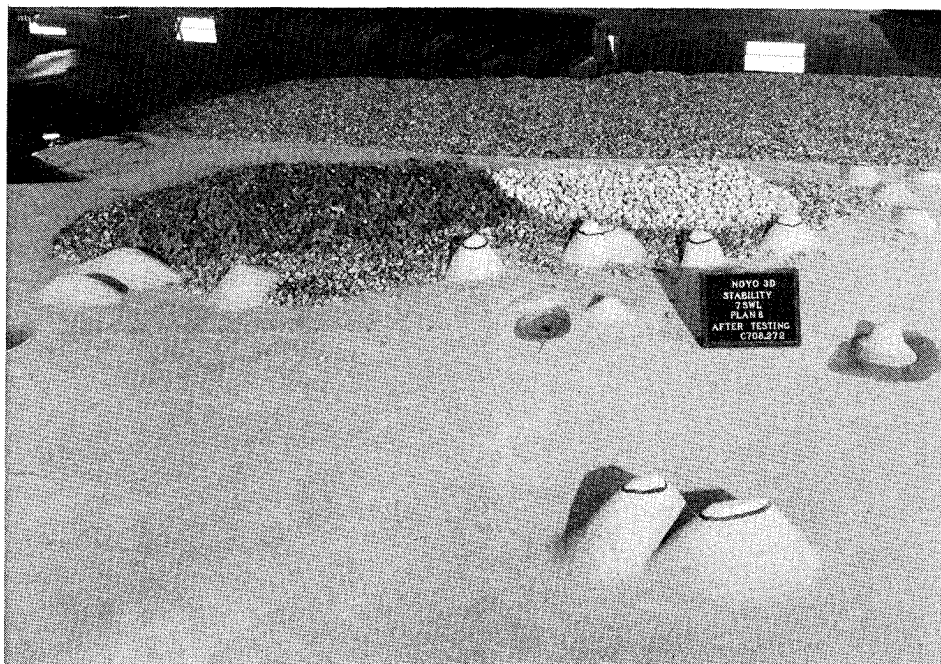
Sea-side view of Plan 8 after Storm IA waves
